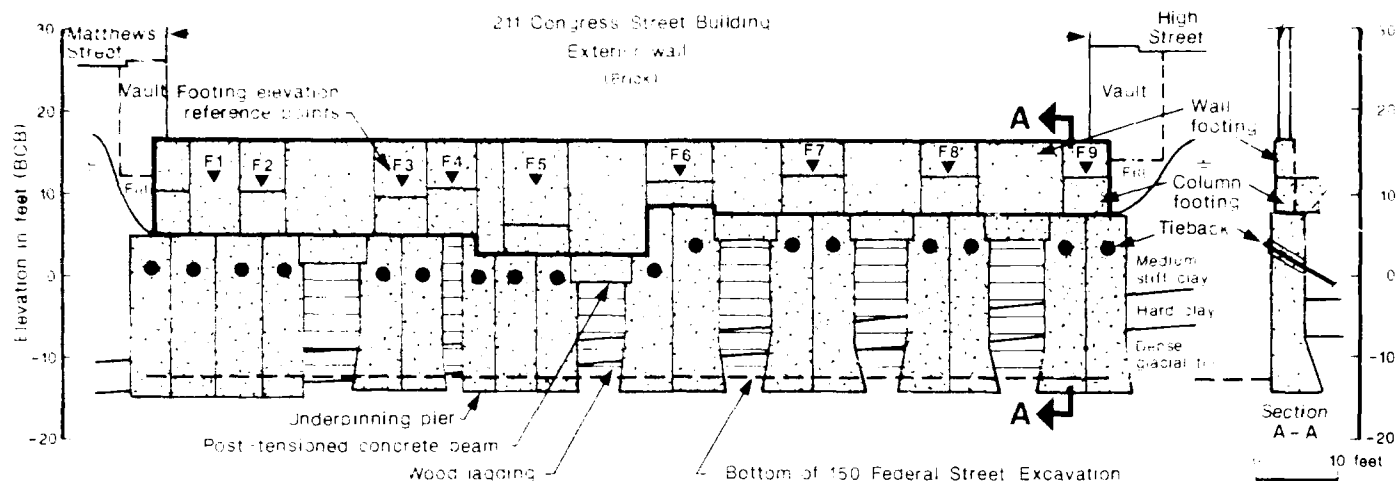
Elevation and Section A-A view of underpinned wall and underpinning system.
